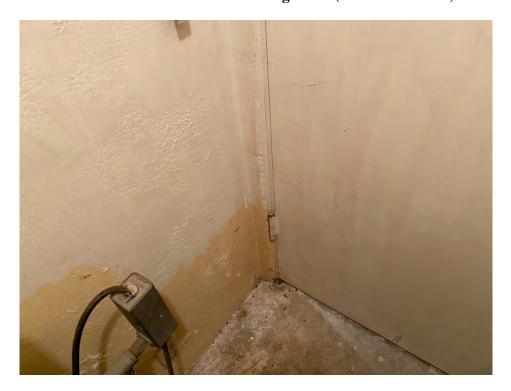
White Plaster Walls, White Wood Door & Casing- 2515 Main St.-CHC Area- Lead-Containing Paint & LBP (Good Condition)
